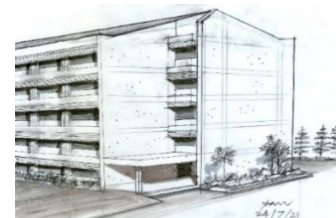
Buildings J and L have no openings on the East-West sidewalls, but they are not made on one side, giving the impression of a strong entrance
